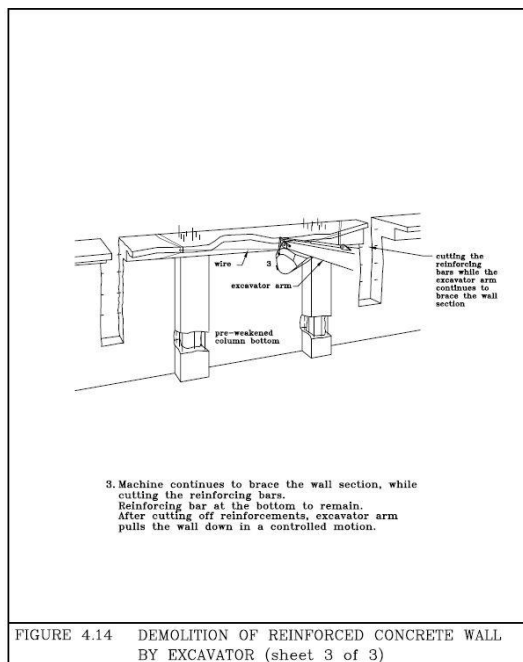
DEMOLITION OF REINFORCED CONCRETE WALL BY EXCAVATOR (sheet 3 of 3)
